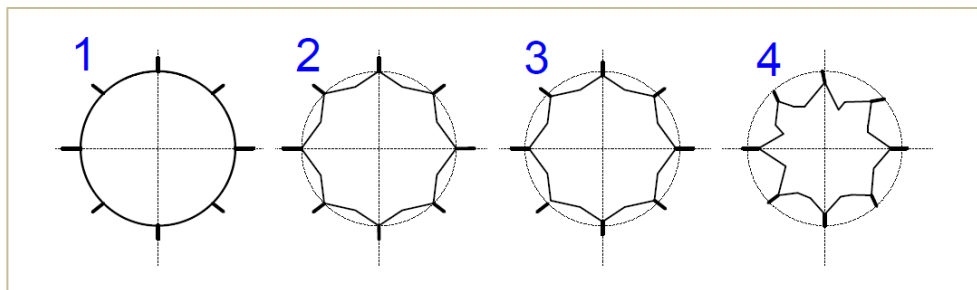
Buckling progress in a typical section for a fully stiffened specimen.
